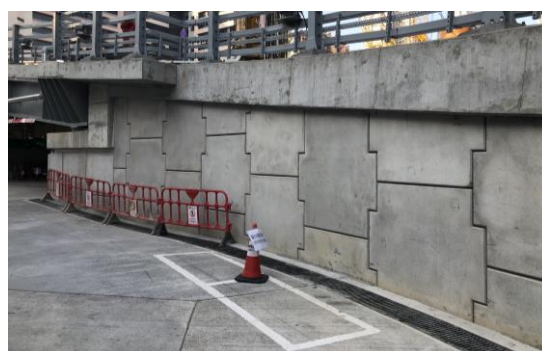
Completion of Reinforced Earth wall with L-shape R.C. seating with steel girder ramp erected
